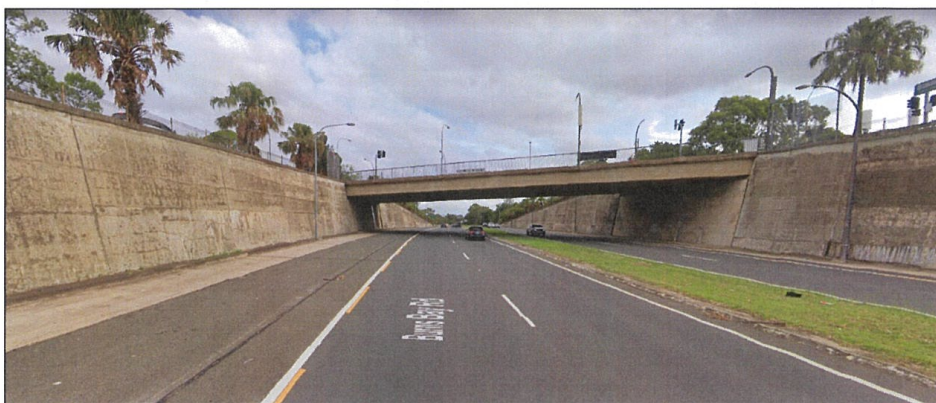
| Church Street overpass (northern elevation) from Burns Bay Road (view southbound)
